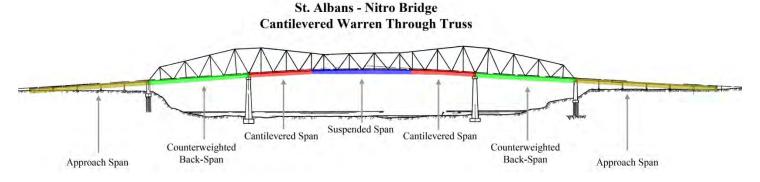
Elevation view of the St. Albans-Nitro Bridge, showing the various components of the cantilevered design.
